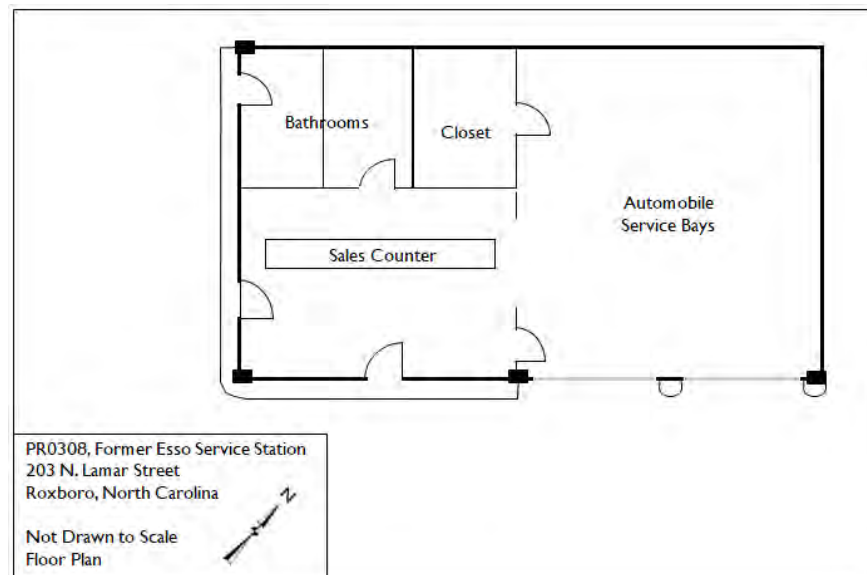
Floor Plan of 203 N. Lamar Street. Not to scale.
